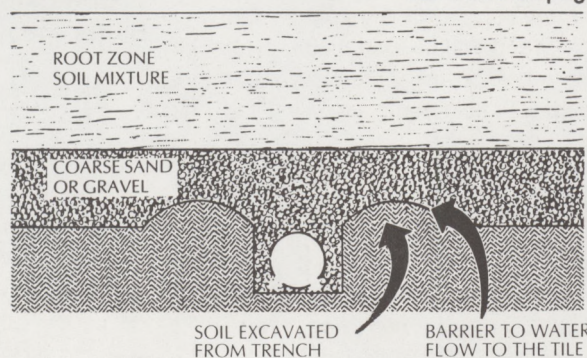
Diagram of soil profile shows problem caused by leaving soil excavated from tile line trench at the site. Water encounters a barrier of fine soil in its flow path to the trench.
